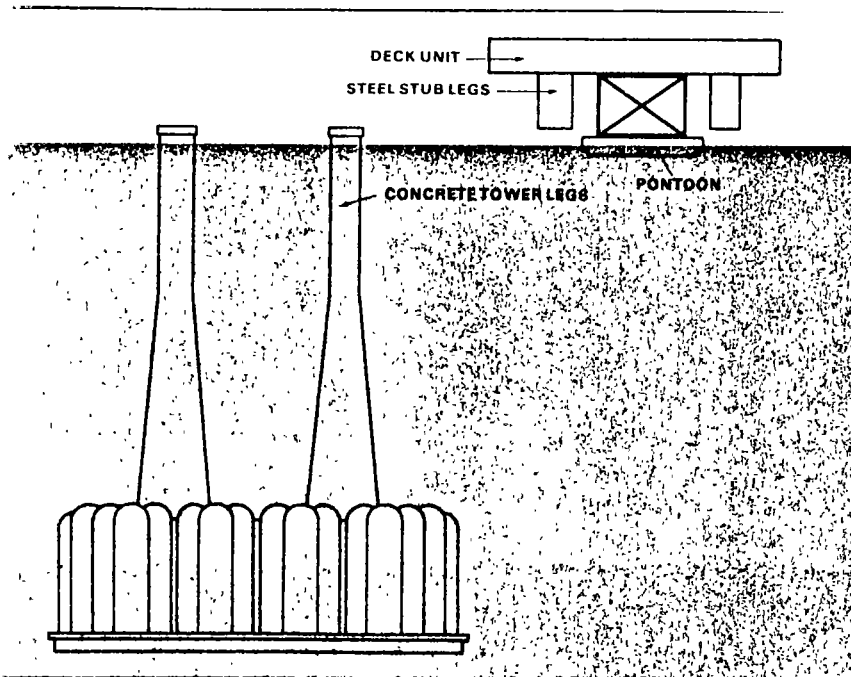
STEEL DECK UNIT FLOATED OUT TO CONCRETE TOWERS AND BASE IN SUBMERGED CONDITION
